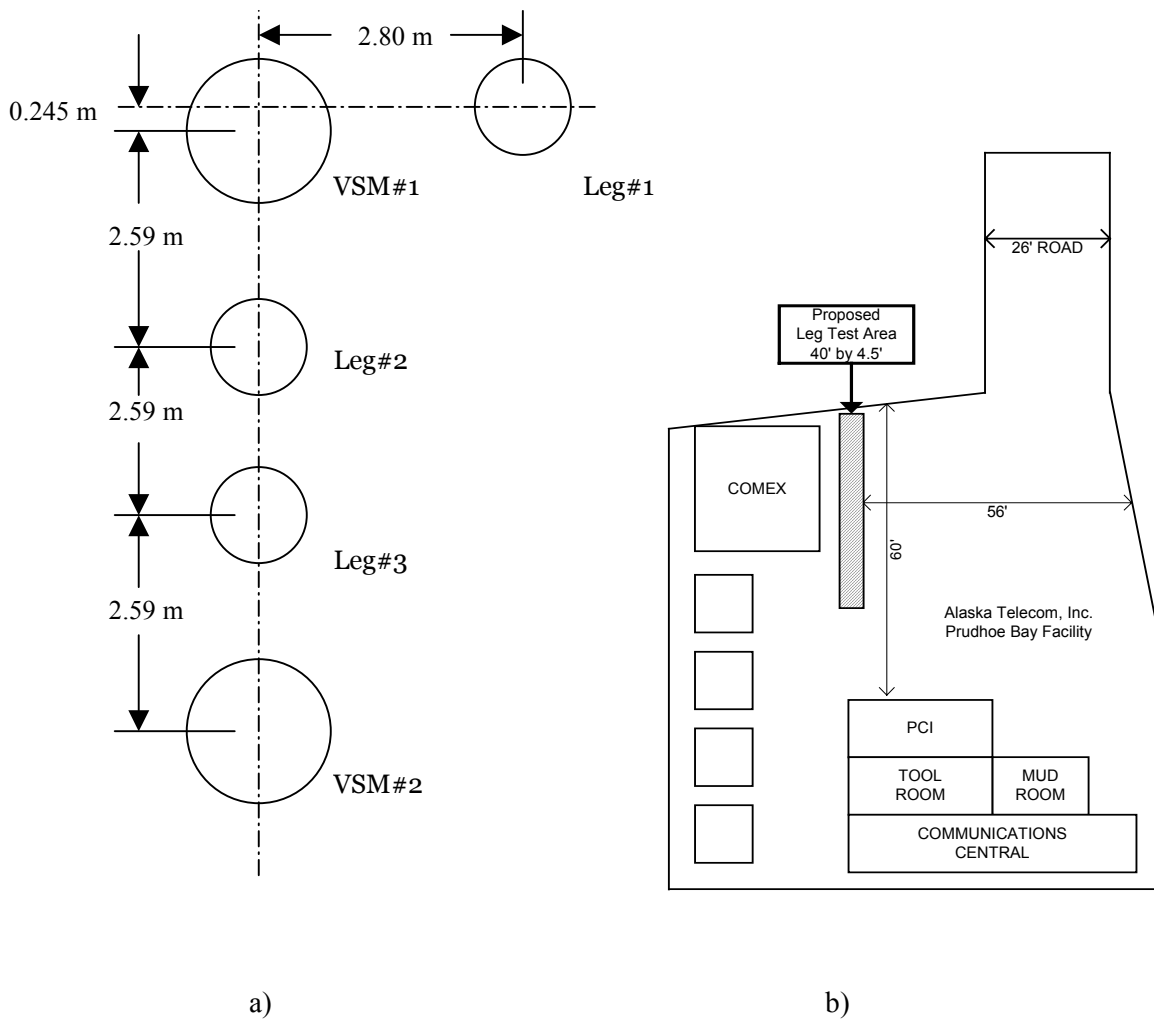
Plan view of test setup a) as built, b) site location (Radoil, Inc. 2002)
